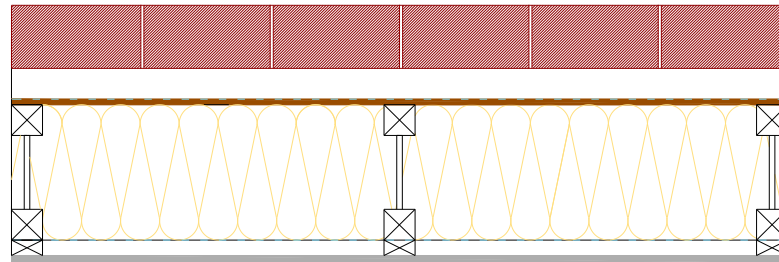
Schematics of a timber frame wall with a service zone using I-section studs
